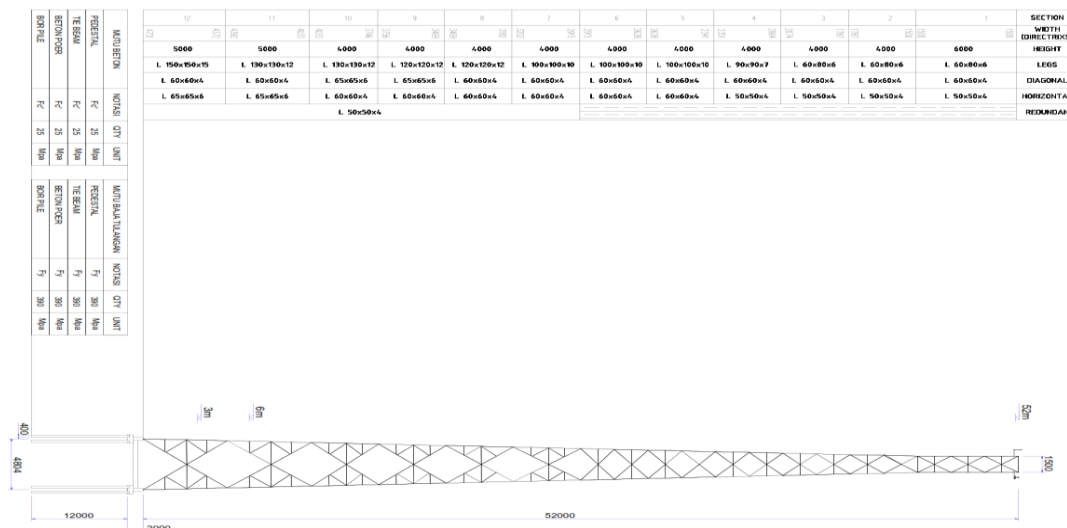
Tower elevation, geometry, and member schedule from the project drawing.
